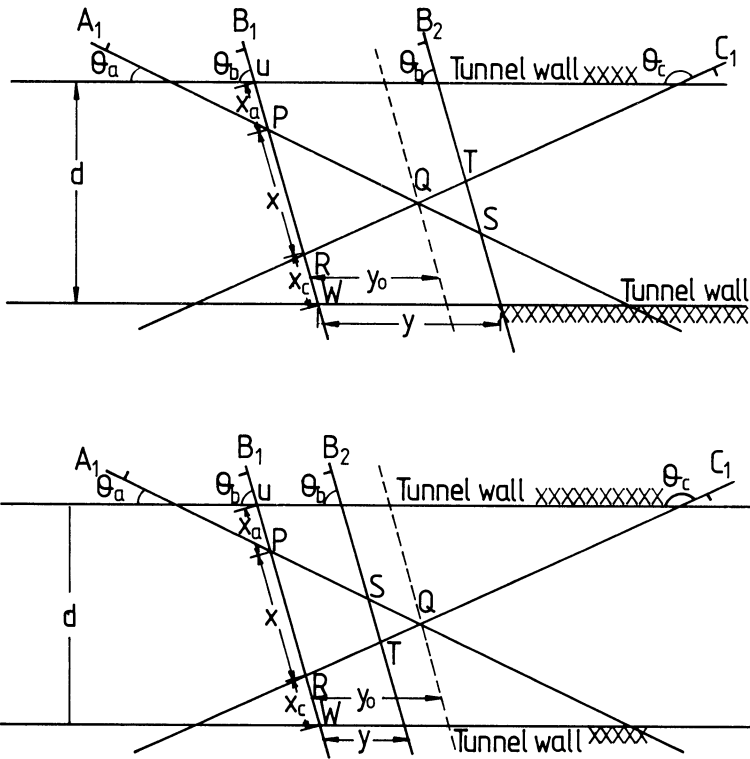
(top). A plan of the tunnel roof showing a single unstable tetrahedral block,  $PQR$ .
